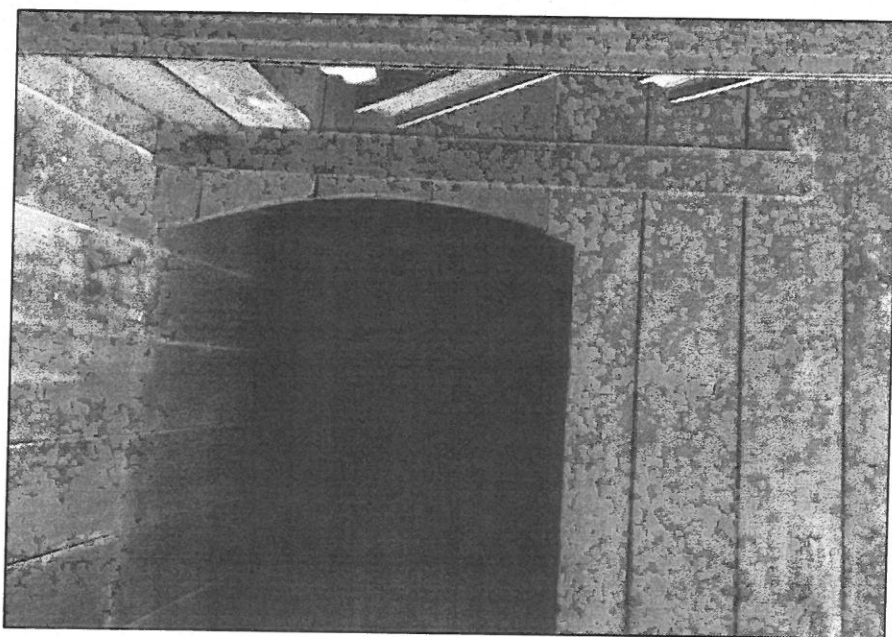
The door opening leading to the second floor apartment from the carriage section of the building (photo taken looking east).
